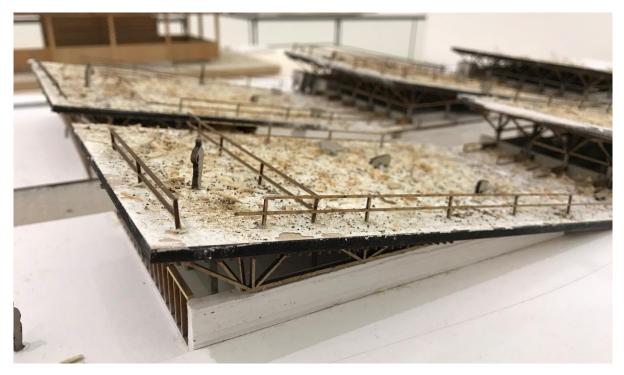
An interesting concept involving rows of pens with paddock areas on the roof to give indoor and outdoor options on two tiers. Author's own photo.
